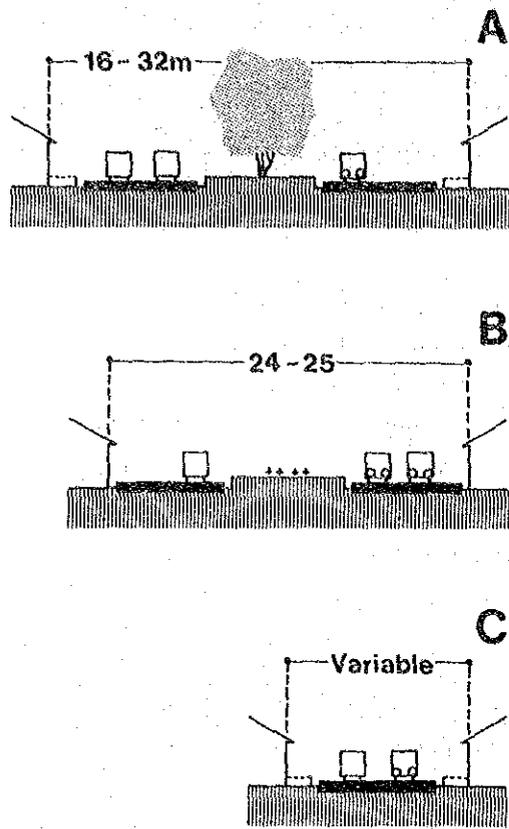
TYPICAL CROSS SECTIONS OF MAJOR ROADS IN SURABAYA
